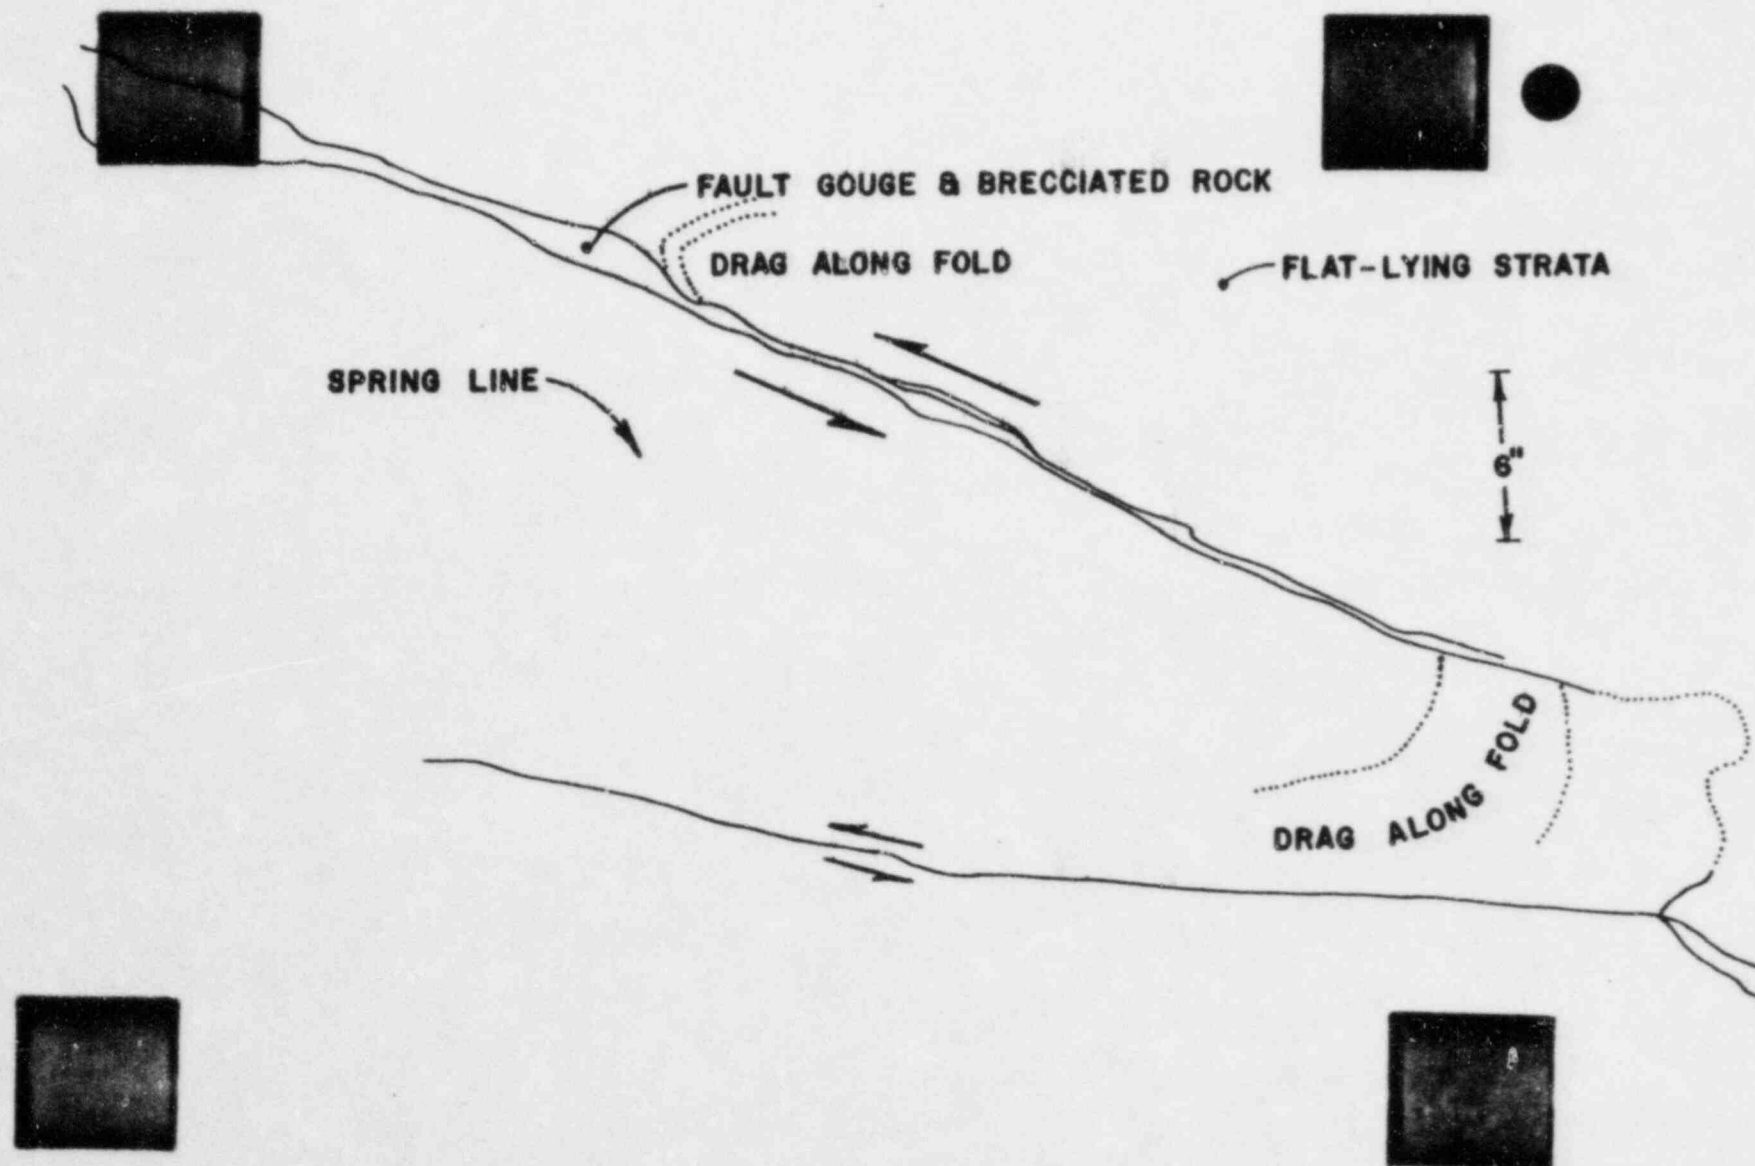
EAST WALL OF INTAKE TUNNEL WHERE FAULT
